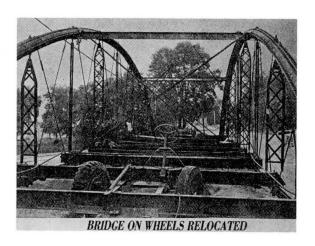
Espyville Road Bridge (1873), a bowstring arch-truss fabricated by the Wroght Iron Bridge Company of Canton, Ohio, was braced, lifted from its abutments, placed on a wheeled under carriage, and driven to a new location over the Olentangy River near Caledonia, Ohio - an unusual, but simple alternative to demolition.
